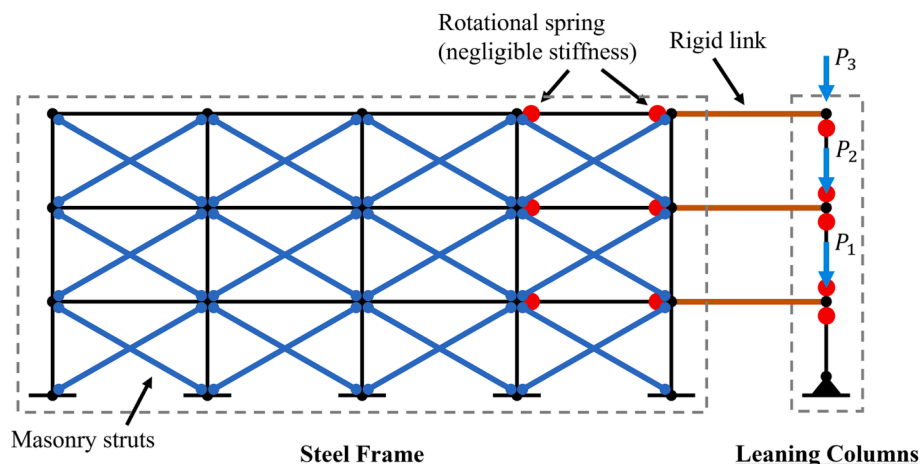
Illustration of the FE modelling in OpenSees: the LA3 building.
